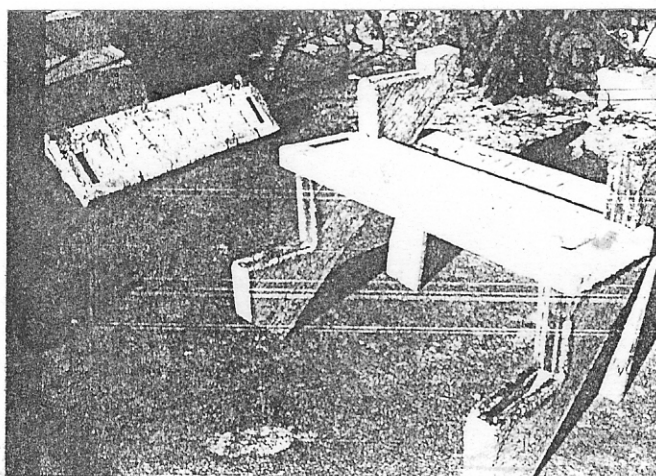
Prefab stringer beams and treads (Etherington 1984)(7).
